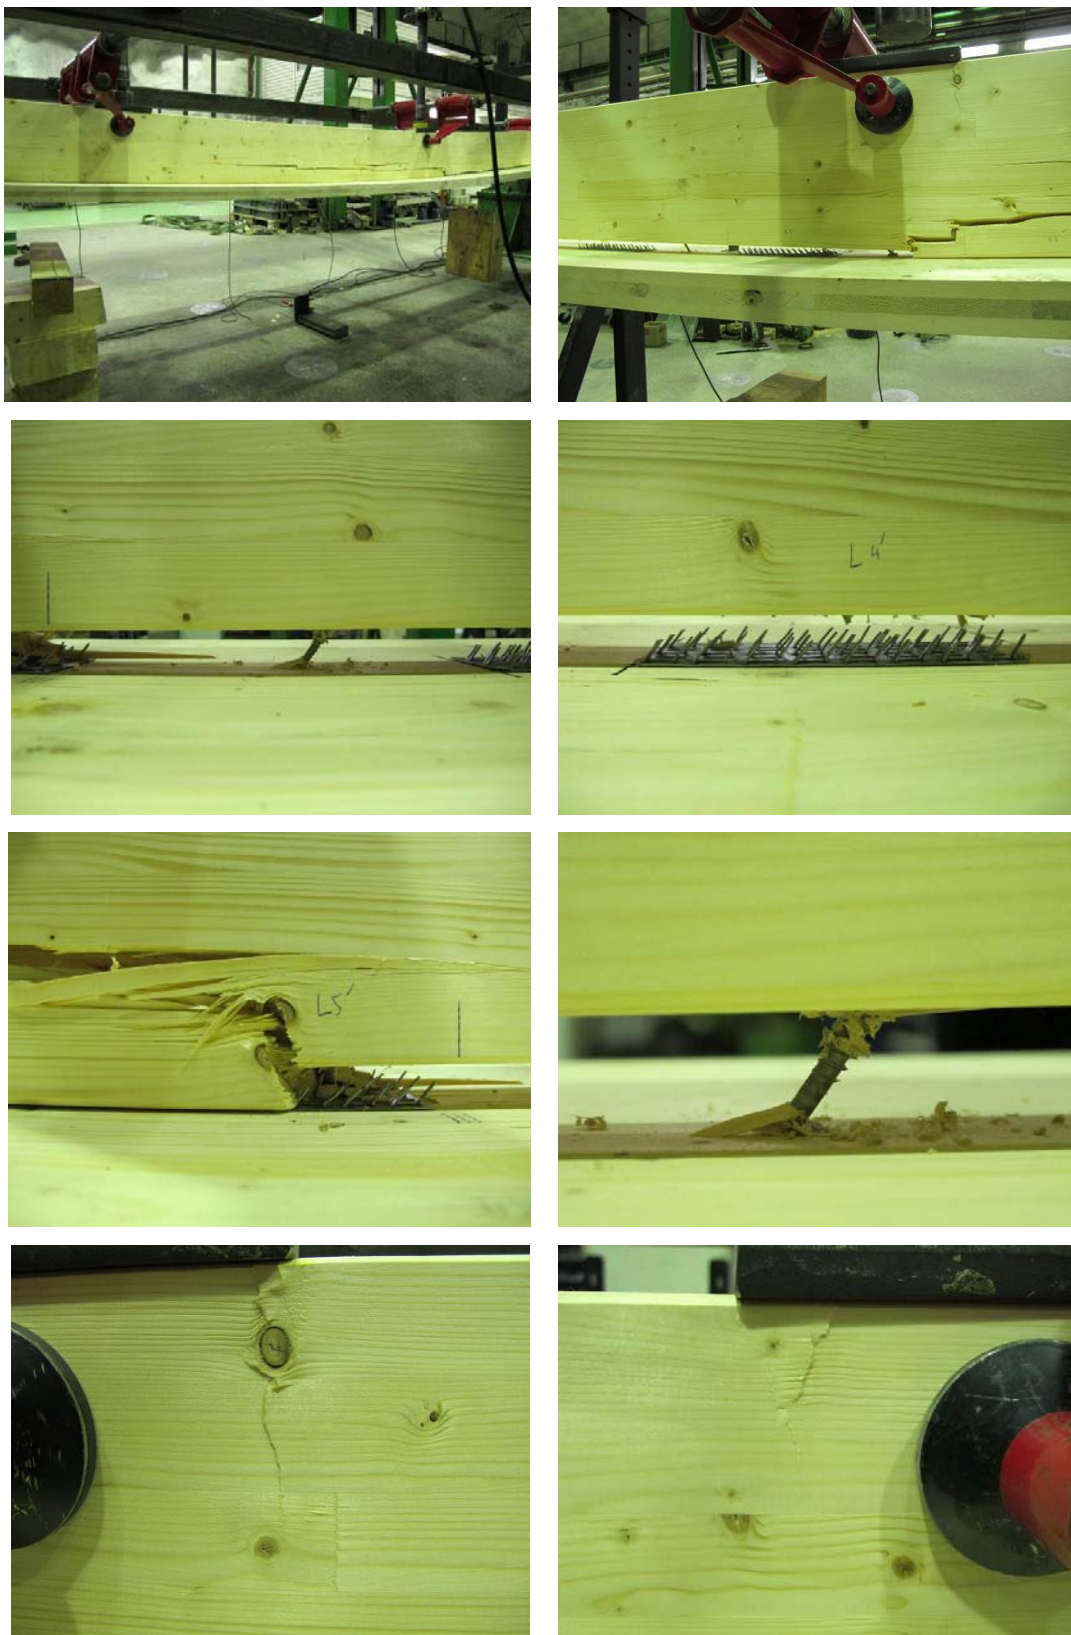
Pictures of beam specimens after failure (Series B3_NP+S)
